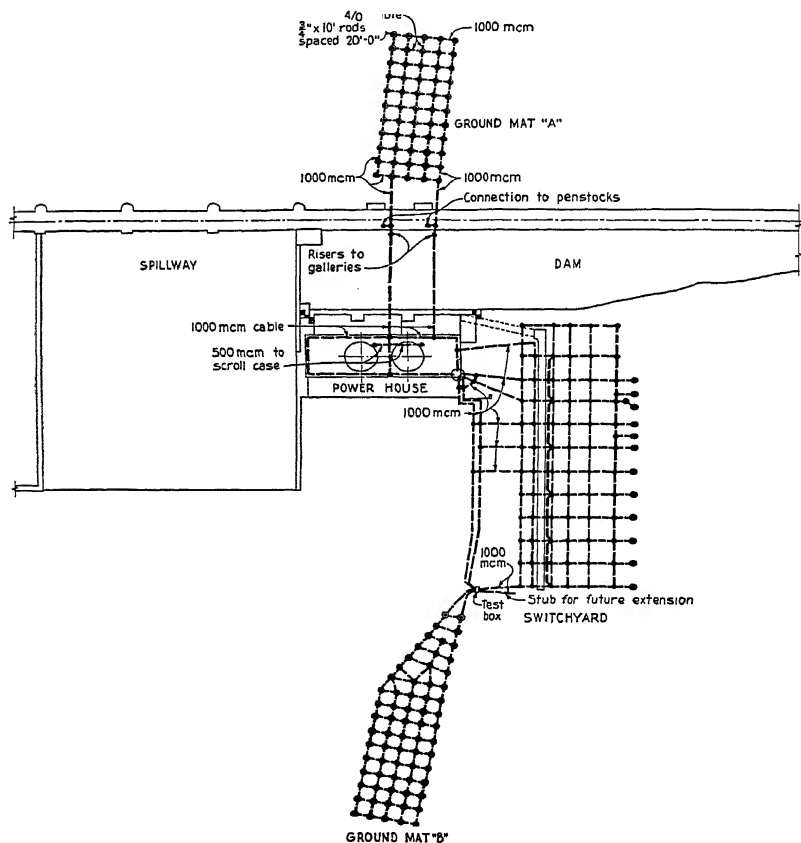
Grounding system for dam, powerhouse, and switchyard.
